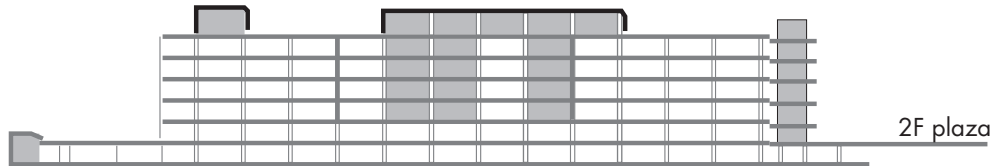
Long section, Olive View Hospital. Note that the shear walls stop at the third floor.
